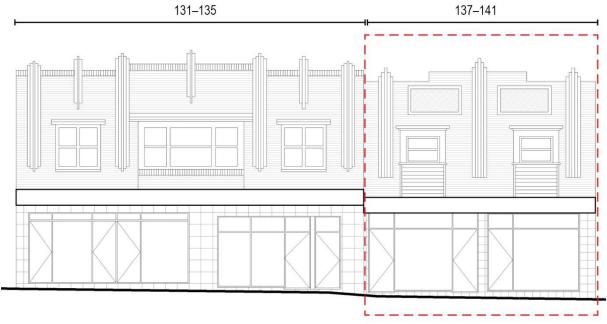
137–141 Keira Street—west elevation. (Source: ADM Architects, October 2016)
